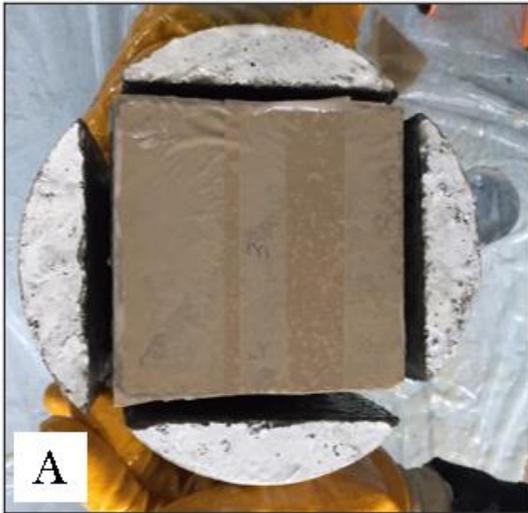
Concrete specimens after applying the primer on the flat surfaces
